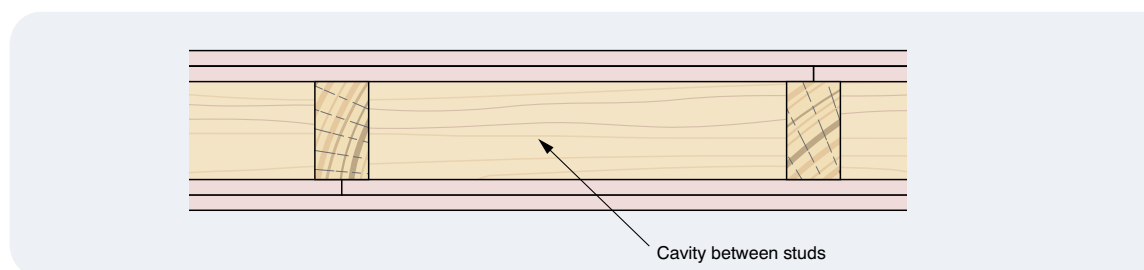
Horizontal section through typical FRL90/90/90:RISF45:NC timber stud wall showing allowable cavity.
